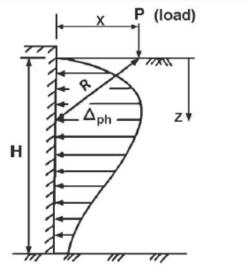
Horizontal Pressure on a Wall Caused by a Point Load
